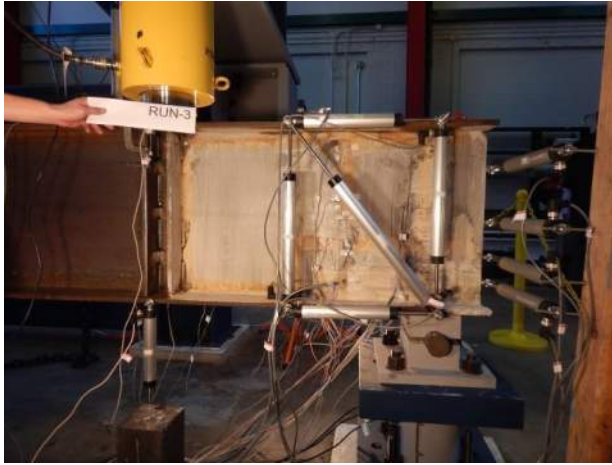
Damaged Girder Left: 24 kip
